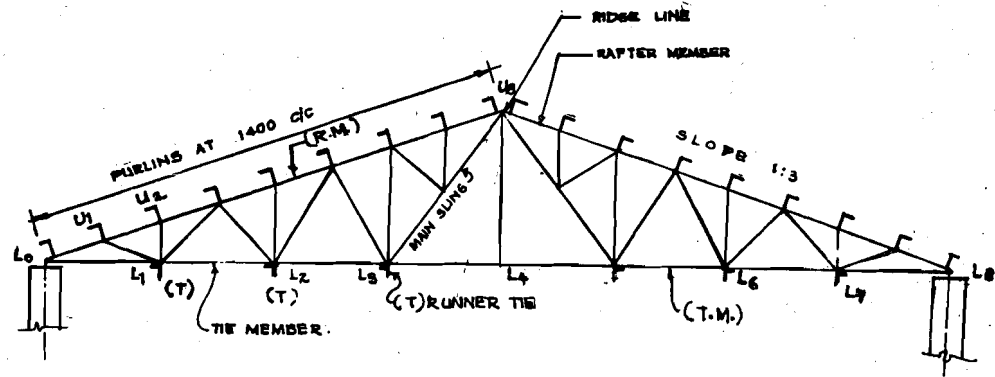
(a) : Typical Roof-truss with Ends on RC Columns
